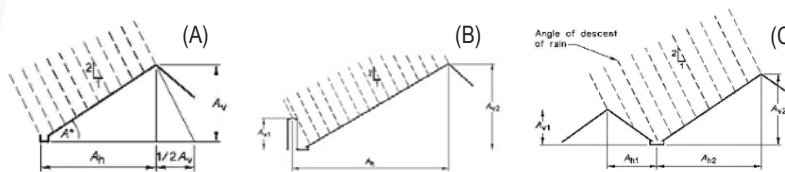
CATCHMENT AREA FOR ROOFS: (A) Single sloping roof - freely exposed to the wind (B) Single sloping roof - partially exposed to the wind (C) Two adjacent sloping roofs
